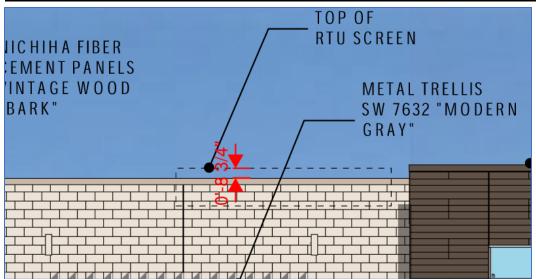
Front elevation showing RTU visible above Aldi building parapet wall
